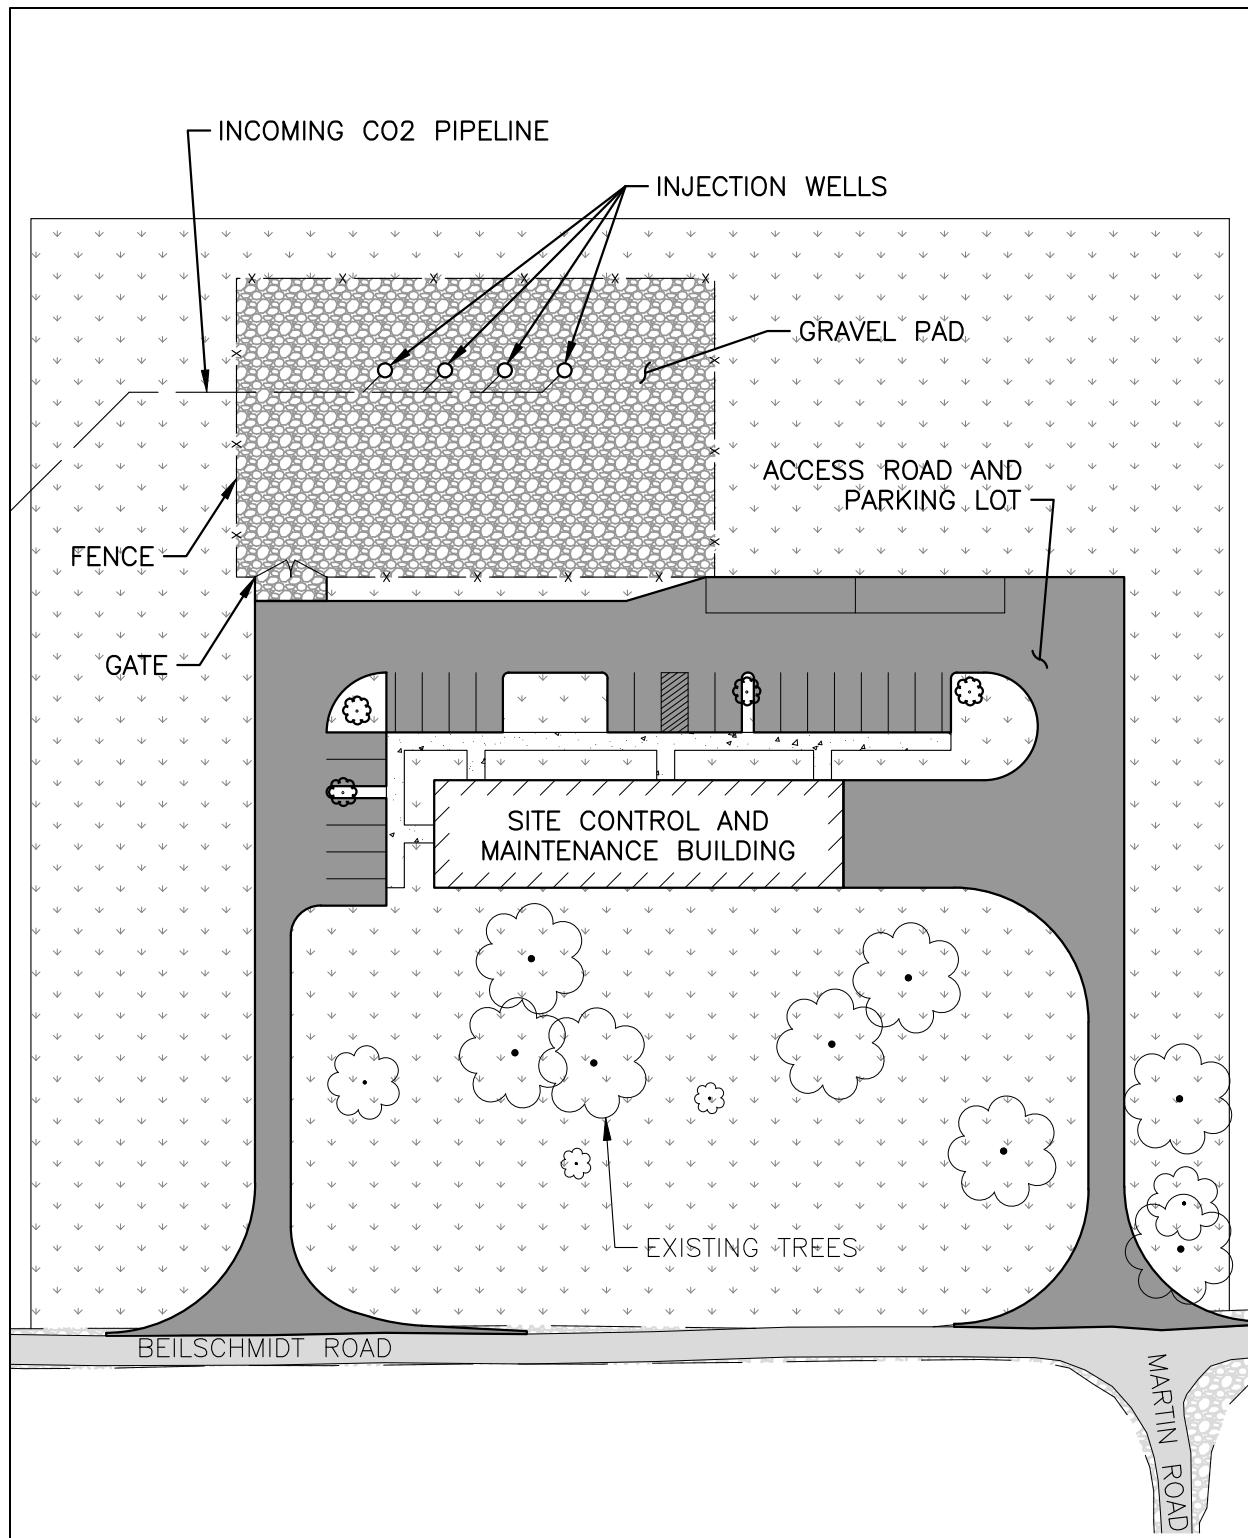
Single-Site Scenario - Injection Well Site Surface Features Conceptual Layout
